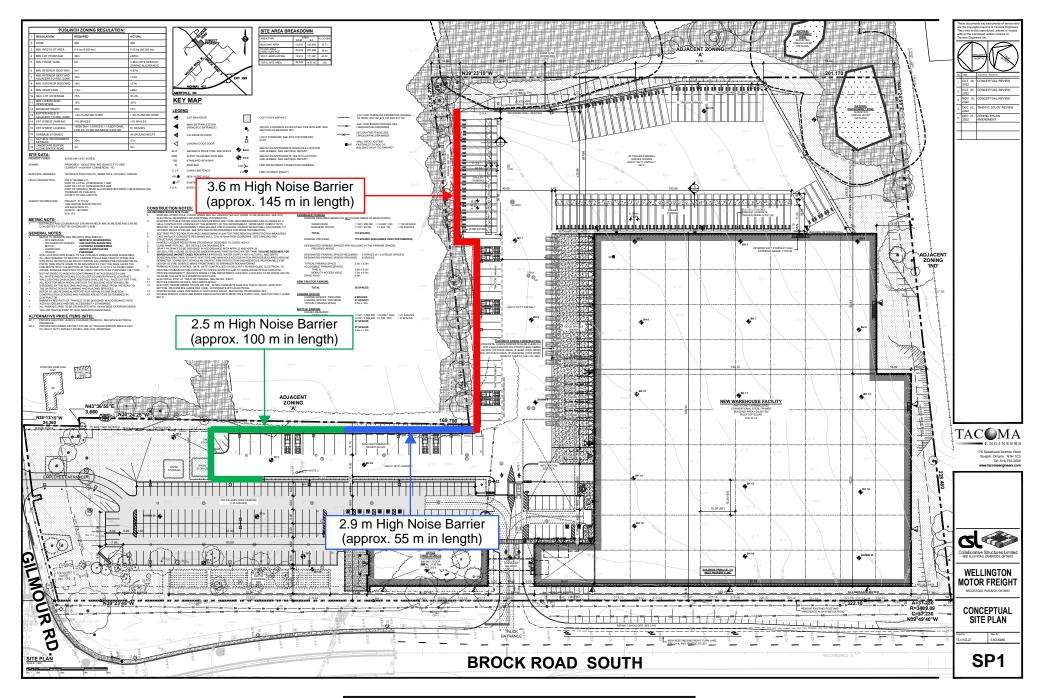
Proposed Site Plan Showing Noise Barrier Location
